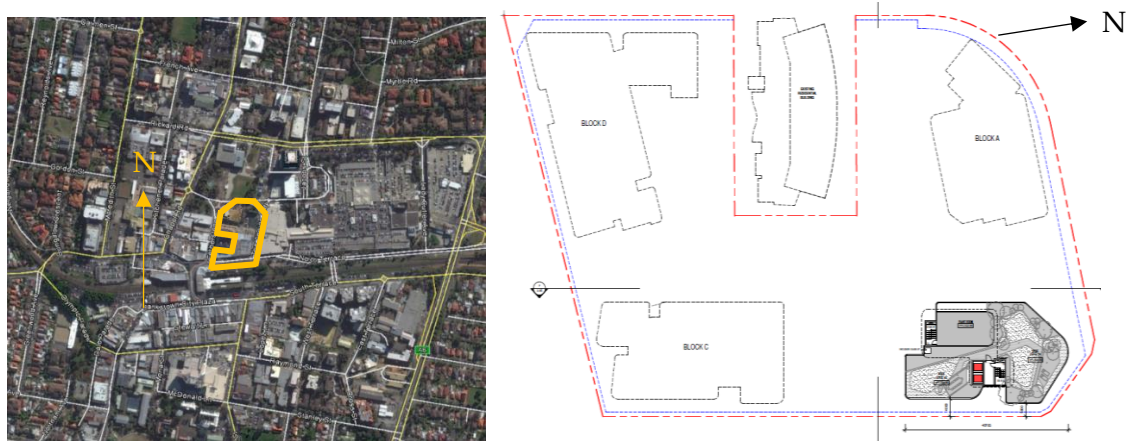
Aerial view with proposed development site highlighted (Google Earth, 2015) (L), and site plan of the proposed development (R)
